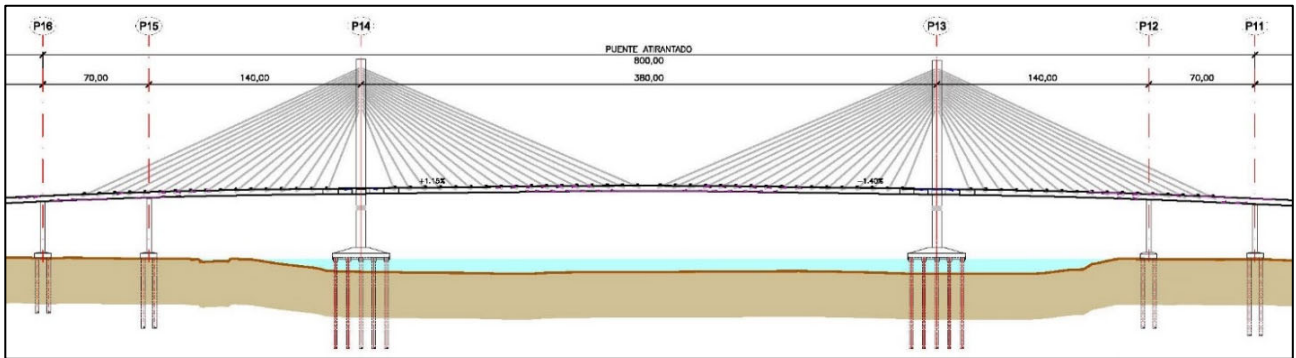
Elevation view of the cable-stayed section of the New Pumarejo Bridge
